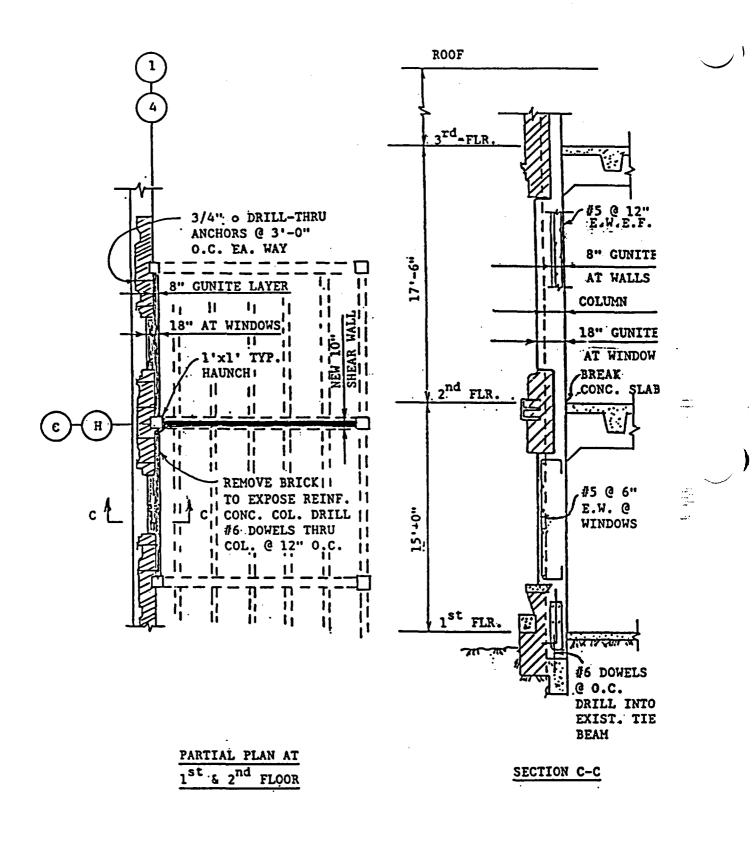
Brick building with concrete framing system. (Sheet 13 of 25)
